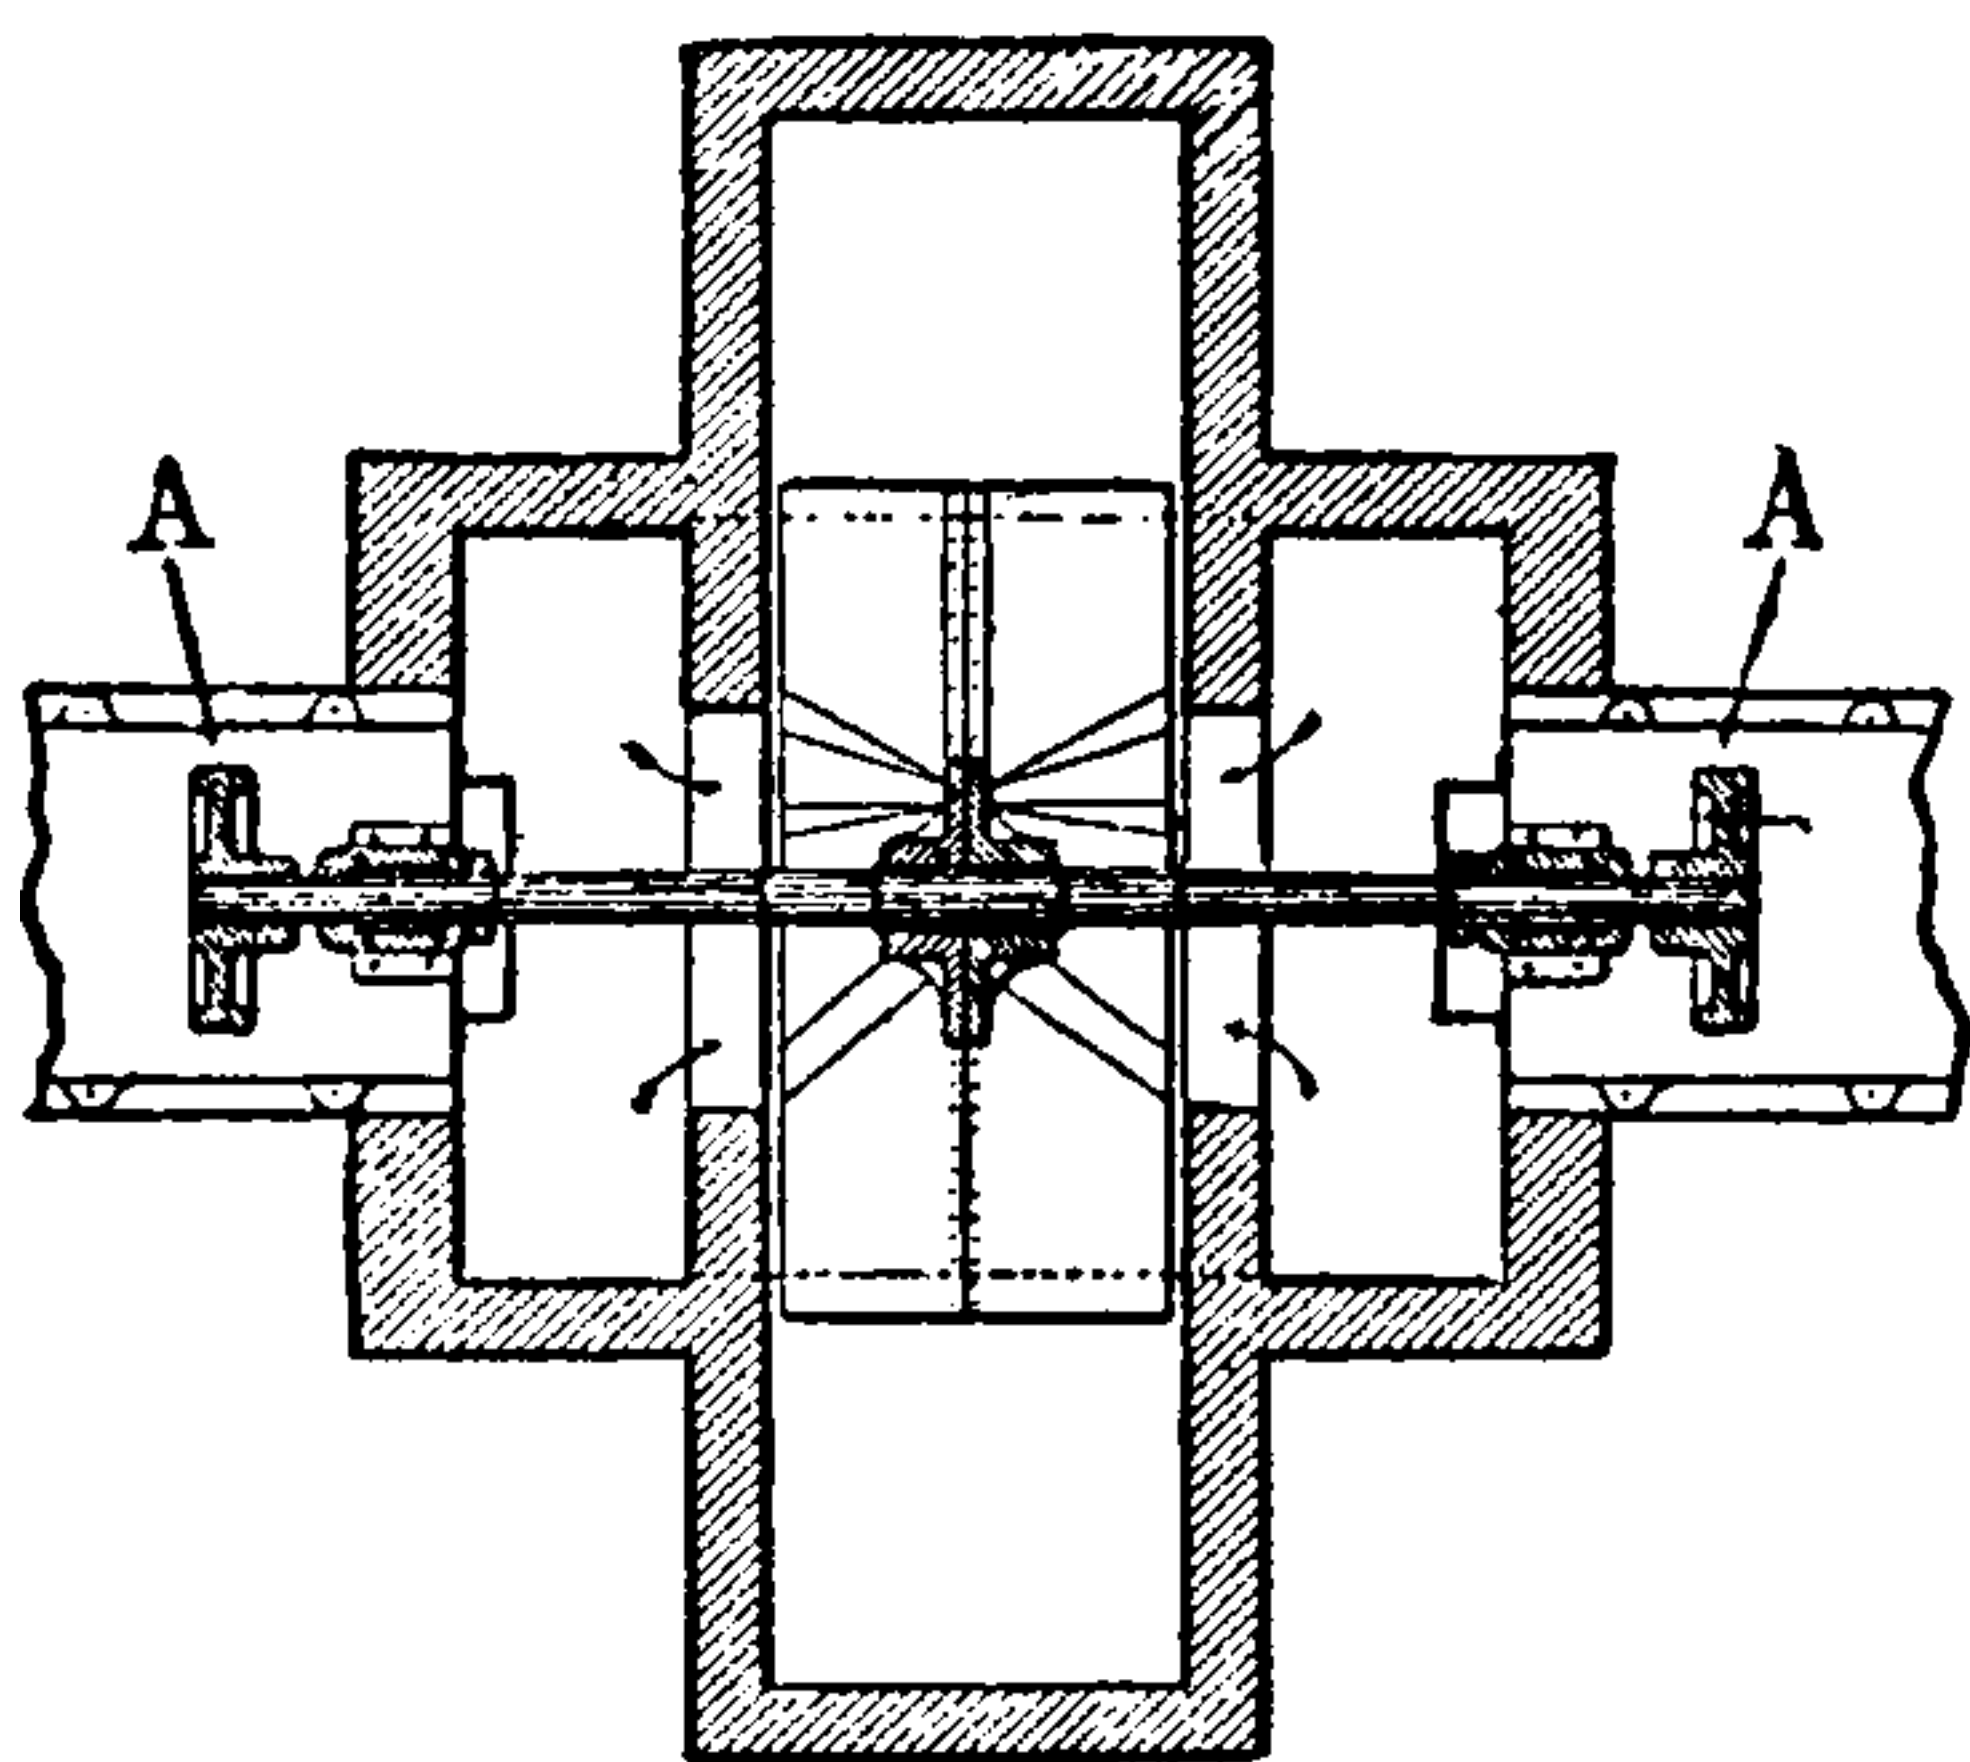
BUMSTEAD AND CHANDLER FAN: TOP SECTIONAL VIEW.
